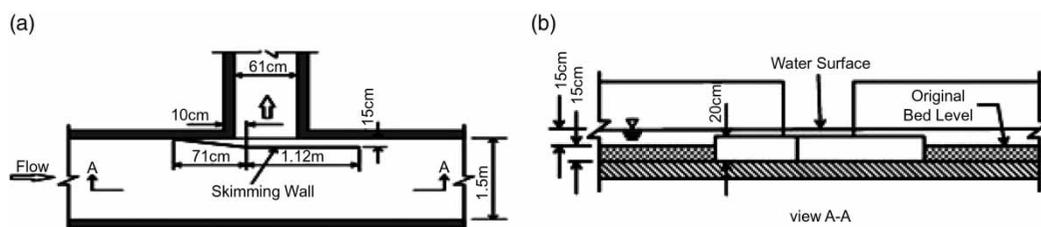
| (a) Plan and (b) cross-section of the skimming wall (Barkdoll *et al.* 1999).
